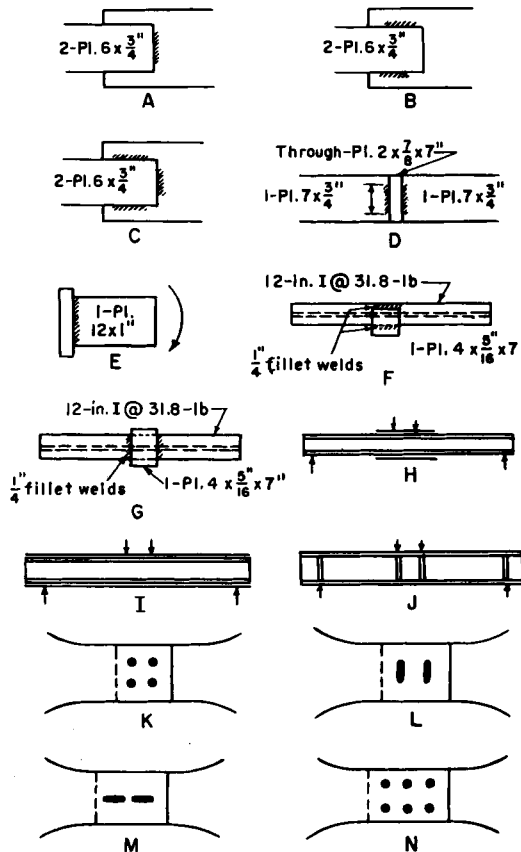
Some of the welded specimens referred to in Table 11.2.
